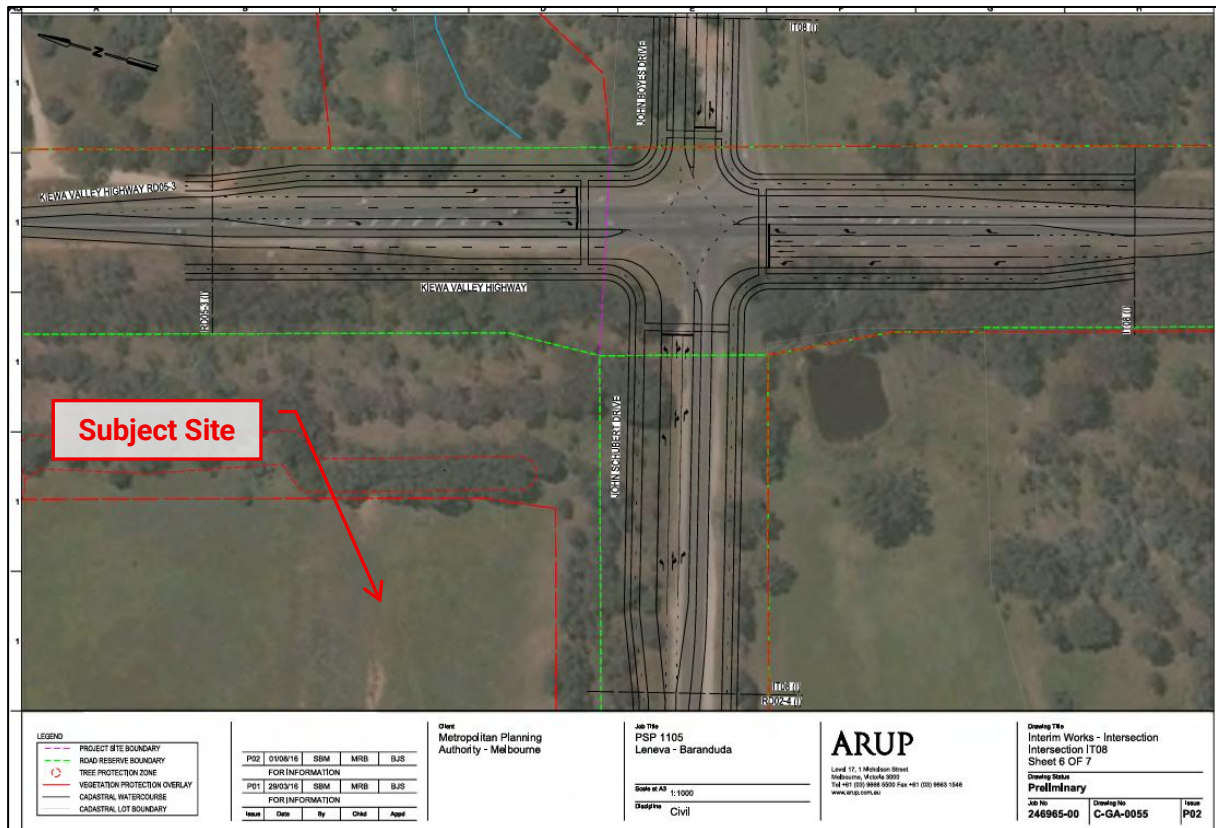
DCP Concept Plan for the Kiewa Valley Highway/John Schubert Drive intersection (IN-08)
